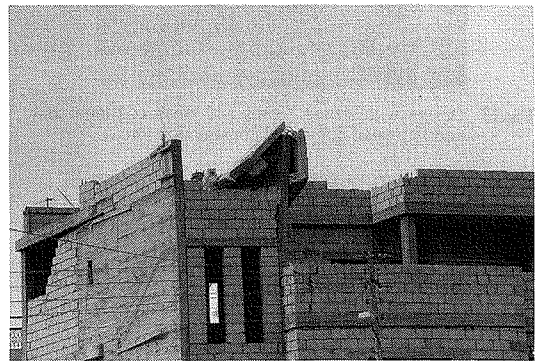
Construction of poor quality: The covering slab of the staircase was simply resting on hollow masonry block walls and poorly connected to the columns.
